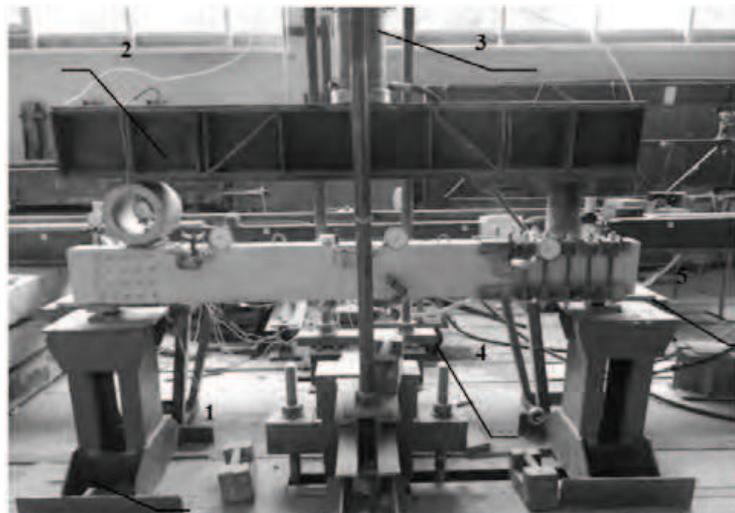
Testing first inclined cross-section: 1 - support, 2 - distributive metal beam, 3 - hydraulic crank, 4 - testing beam, 5 - metal jacket
